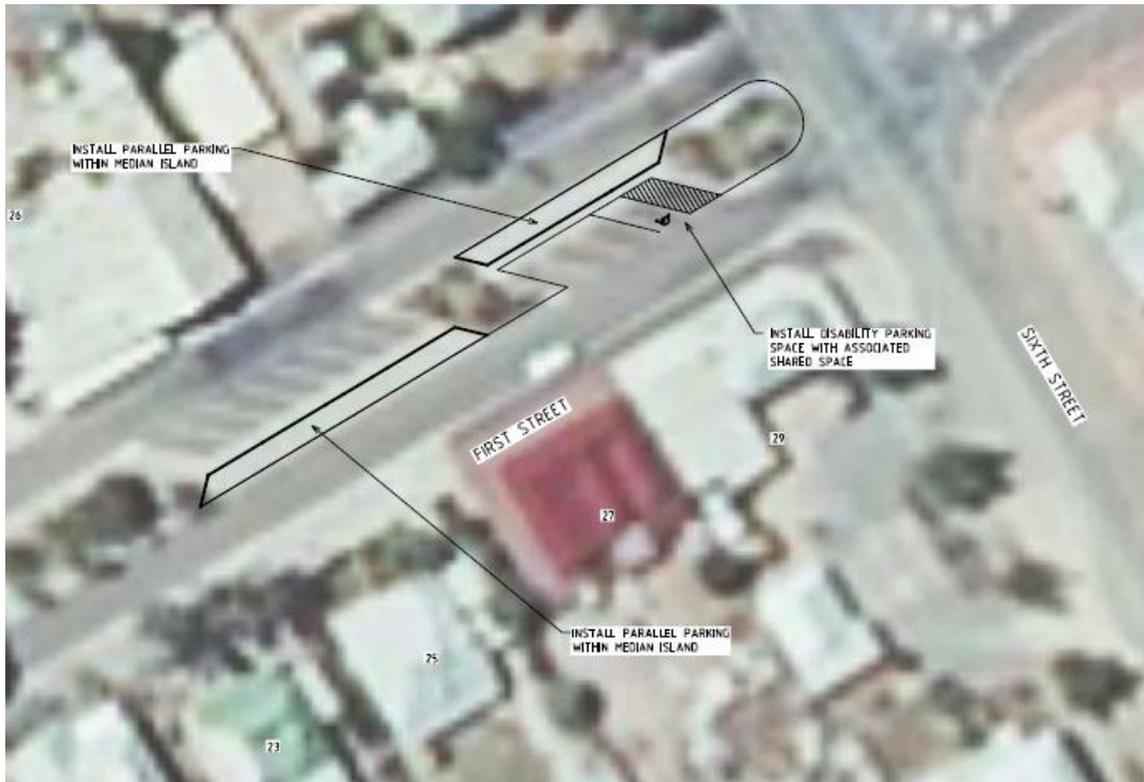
Parking and Footpath Concept Layout around Hospital
